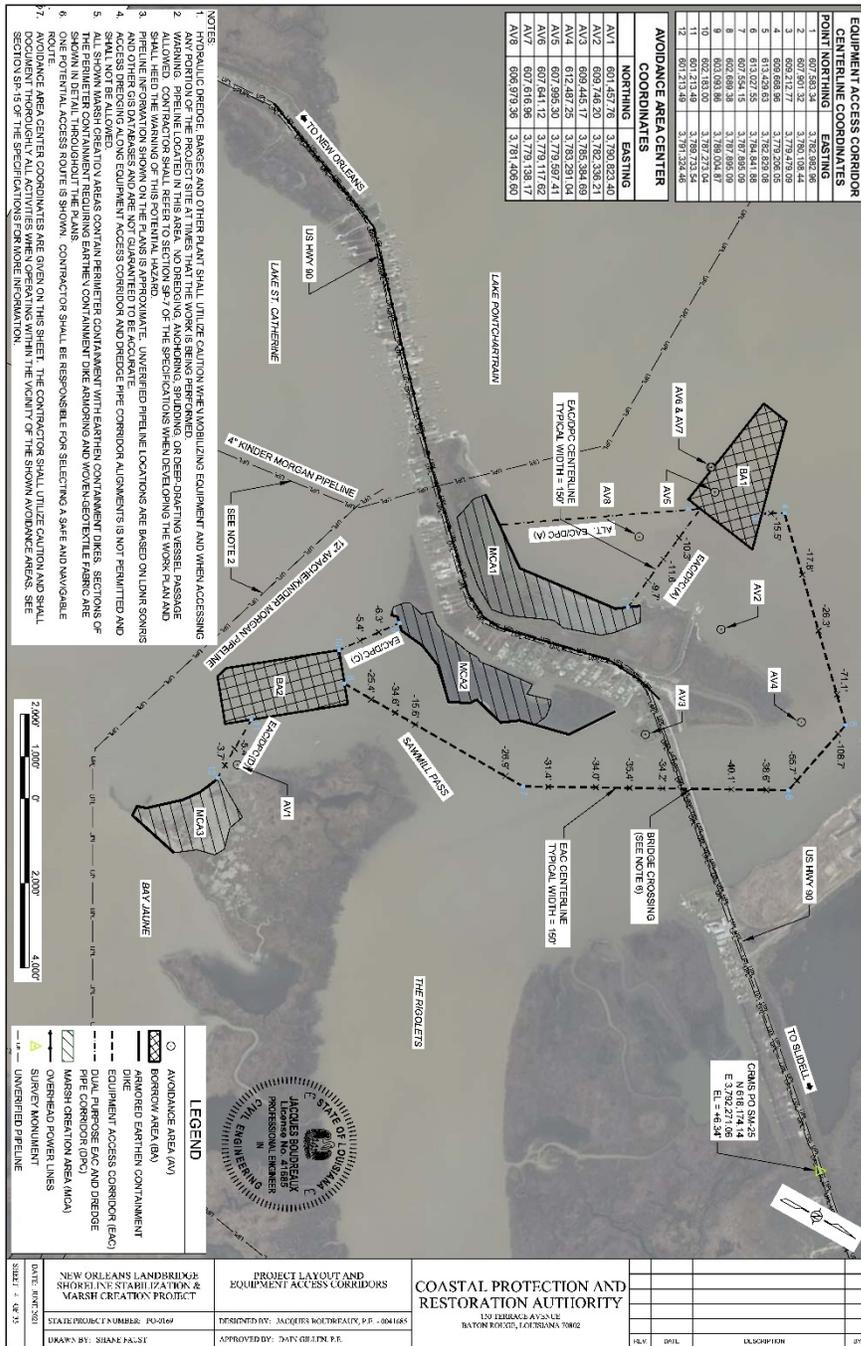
Final Design – New Orleans Landbridge Equipment Access and Dredge Pipe Corridors Overview
